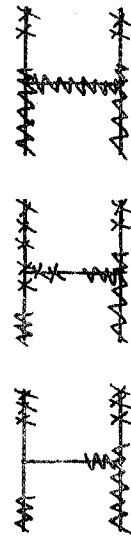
(b) Possible Yield Configurations for the Wide Flange Section After Combining Top and Bottom Flanges of Fig. 2.11(a)
